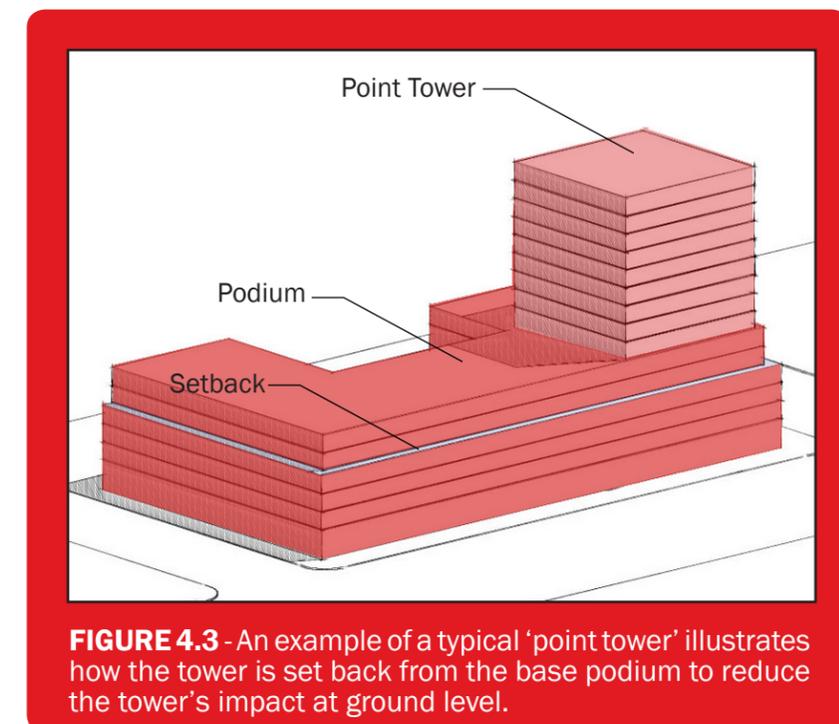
An example of a typical ‘point tower’ illustrates how the tower is set back from the base podium to reduce the tower’s impact at ground level.
